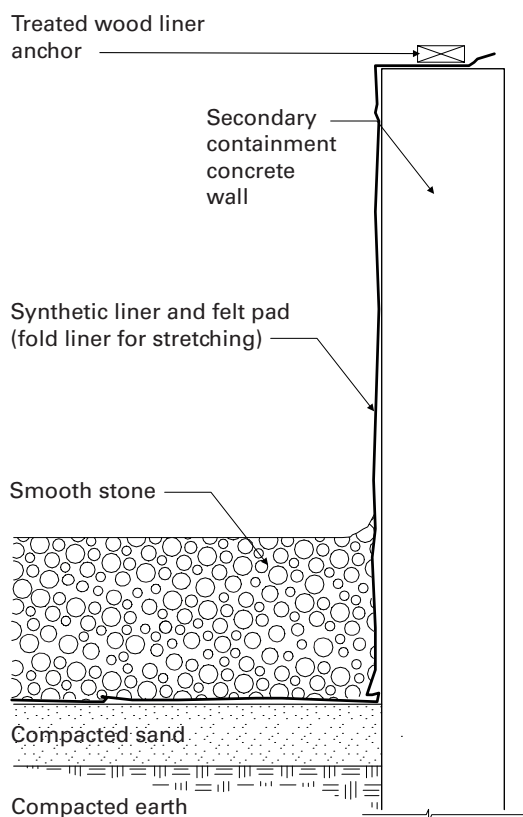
Synthetic liner with concrete wall for secondary containment.
